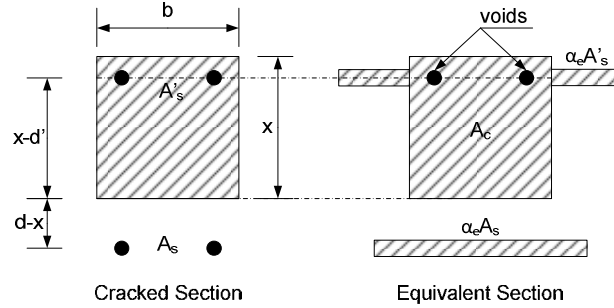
The Cracked Reinforced Concrete Section (Kong and Evans, 1987).
